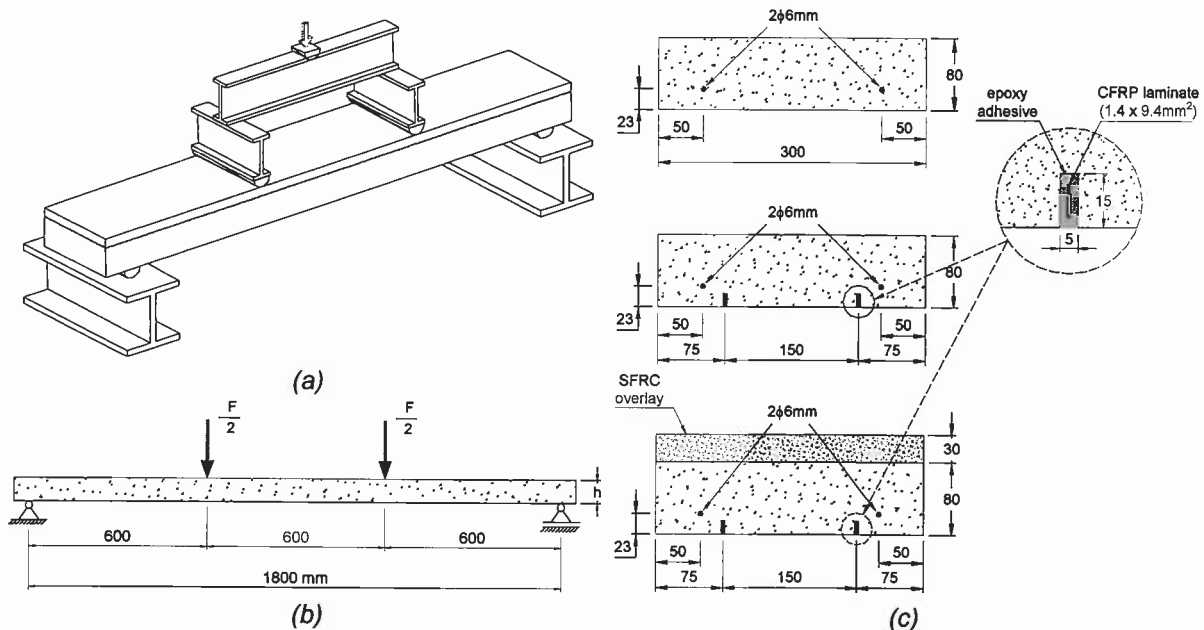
Test setup (a), test configuration (b), and specimens cross-section dimensions (c).
